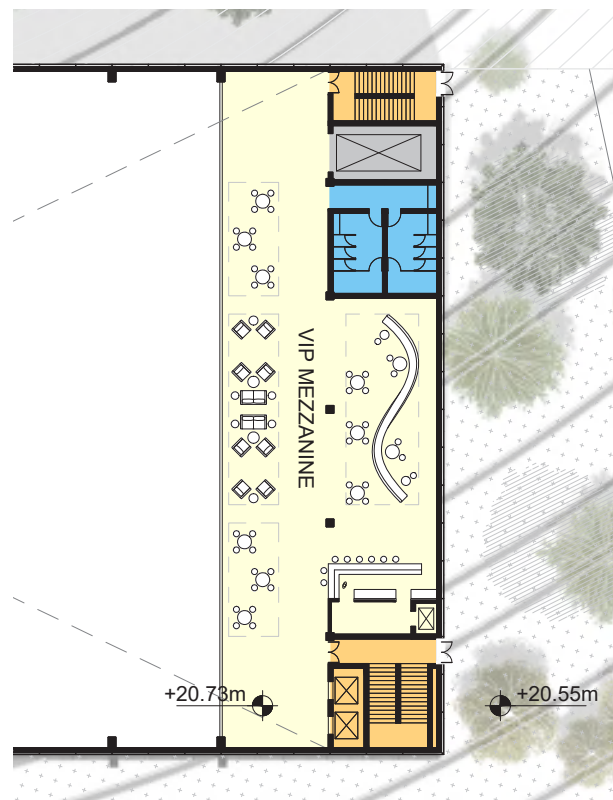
EXHIBITION CENTRE - BRIDGE LEVEL PLAN - SCALE 1:500
